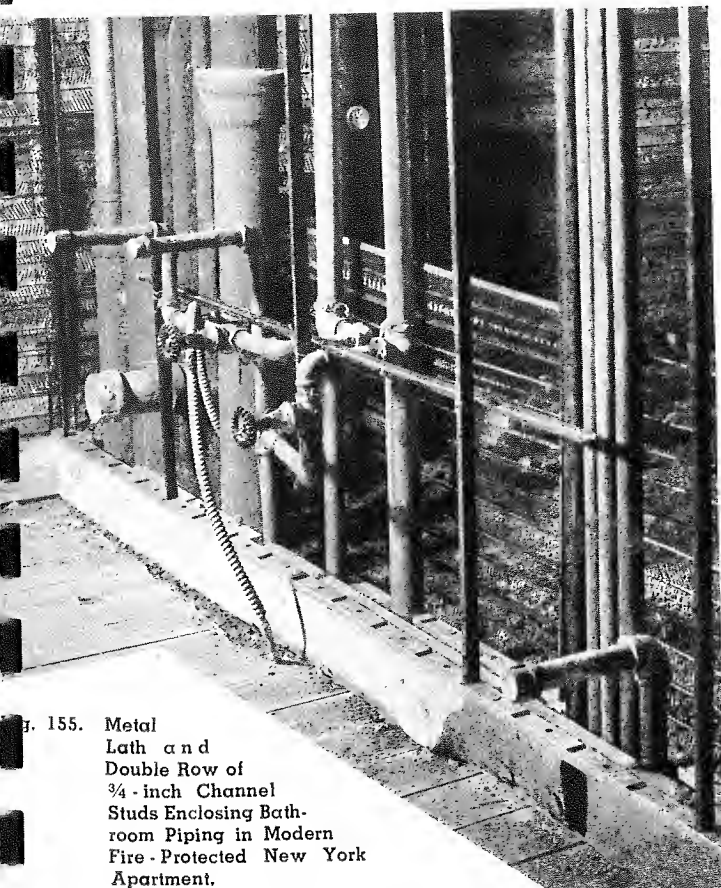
Metal Lath and Double Row of ¾-inch Channel Studs Enclosing Bathroom Piping in Modern Fire-Protected New York Apartment.
